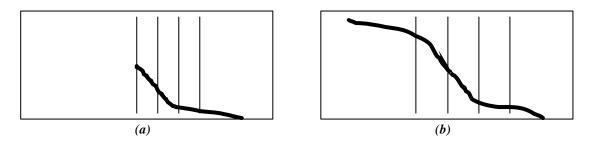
5: Possibility of crack intersect with stirrup
